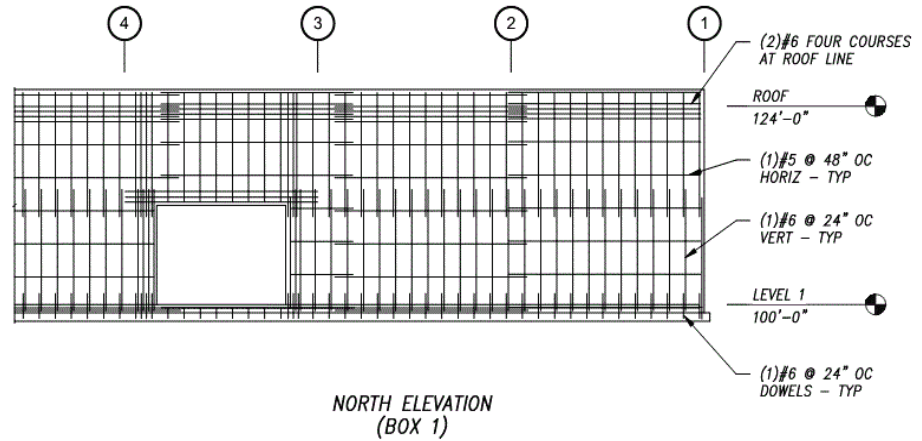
Single-story retail/industrial/warehouse building North elevation: BOX1.
